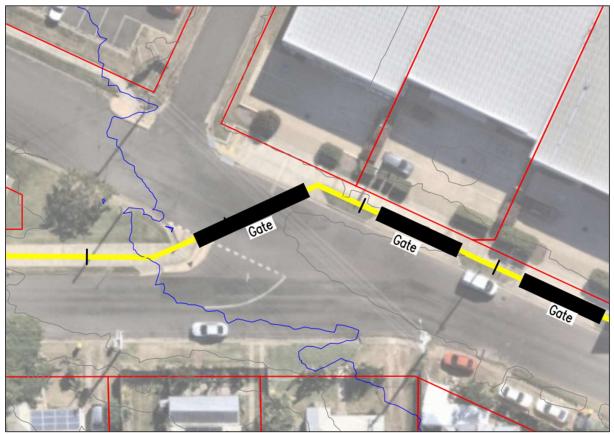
Scotland Street / Quay Street East / School Lane Preliminary Wall Layout
